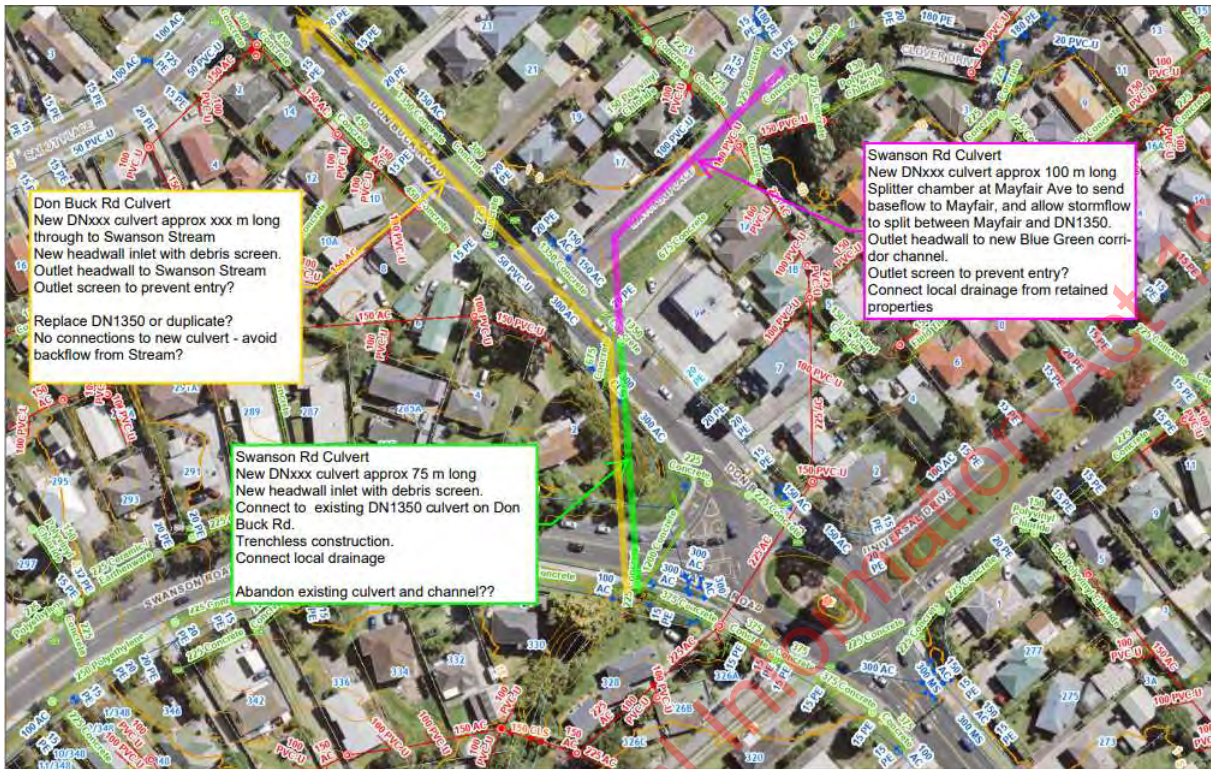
Indicative works surrounding Mayfair Place (Source: Healthy Waters)
